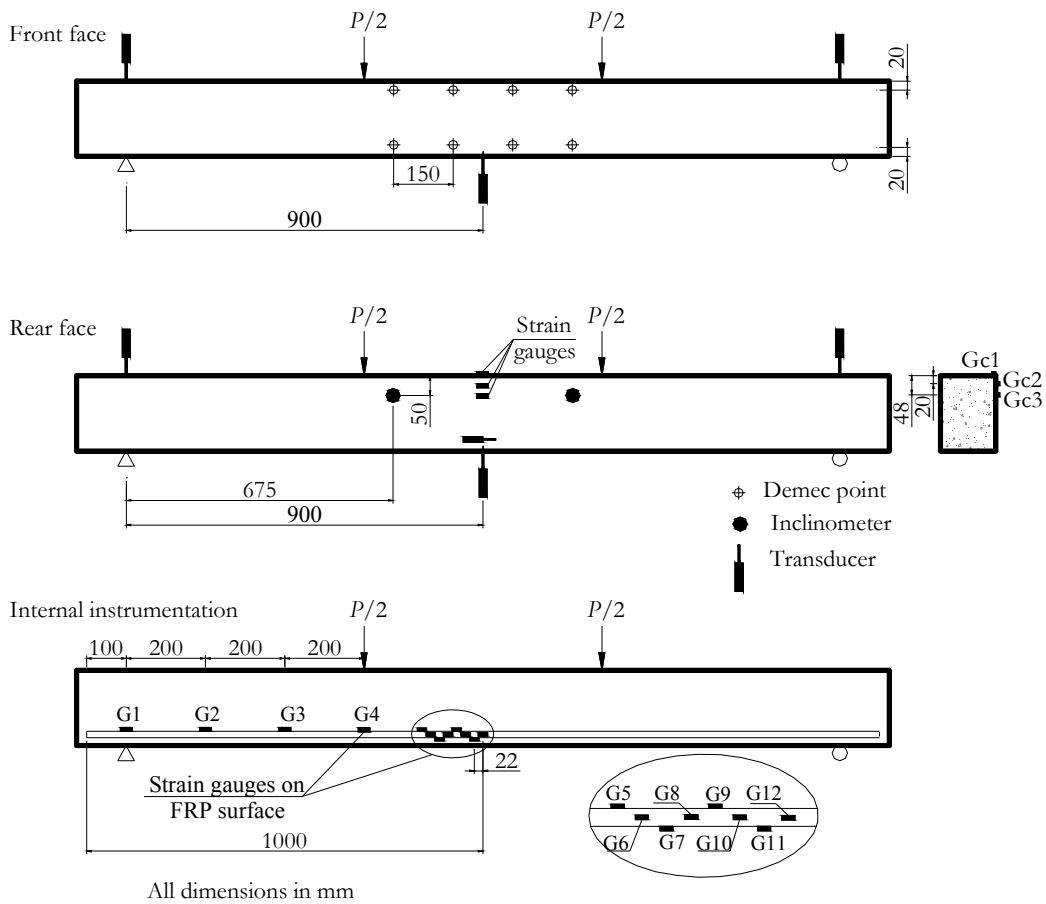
Instrumentation details for beam C2-216-D2-B.
